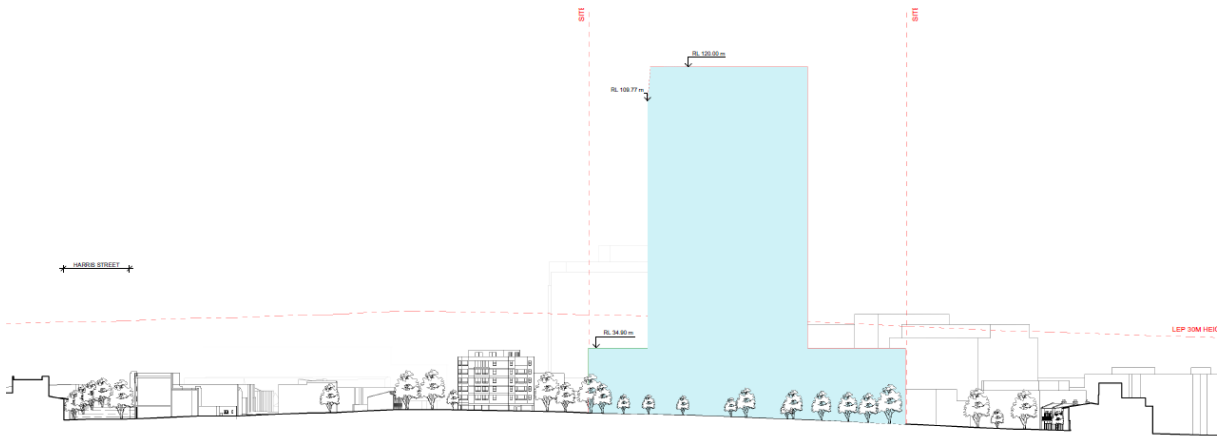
Envelope elevation from Pyrmont Bridge Road
